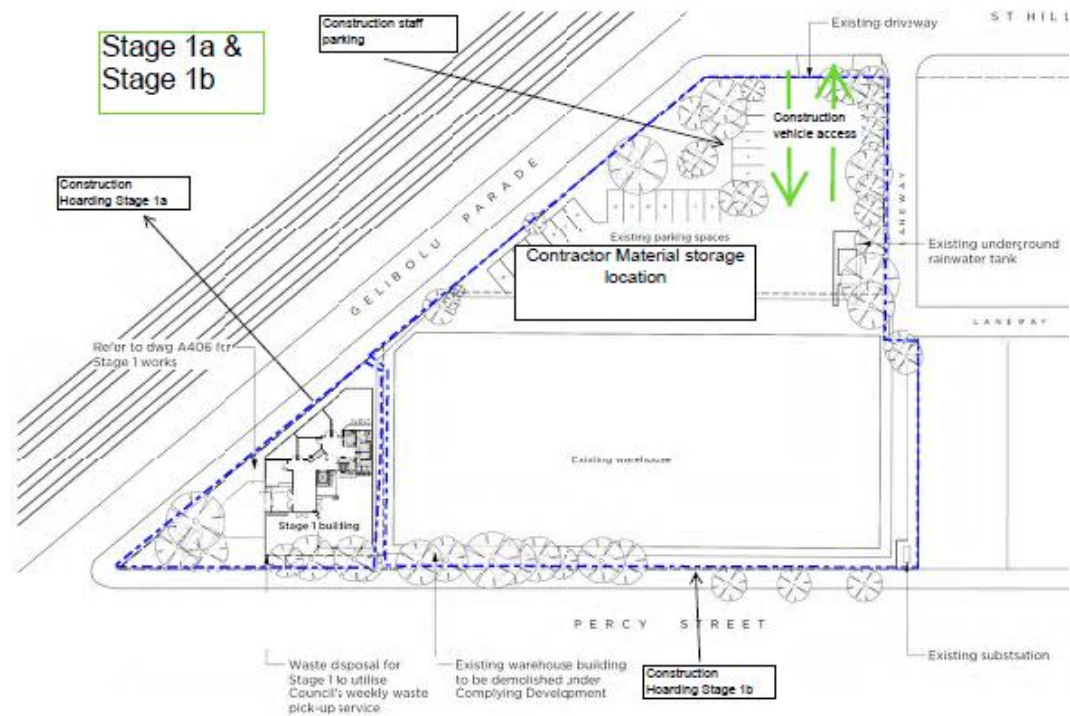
Stage 1B construction works plan – demolition of existing warehouse building
